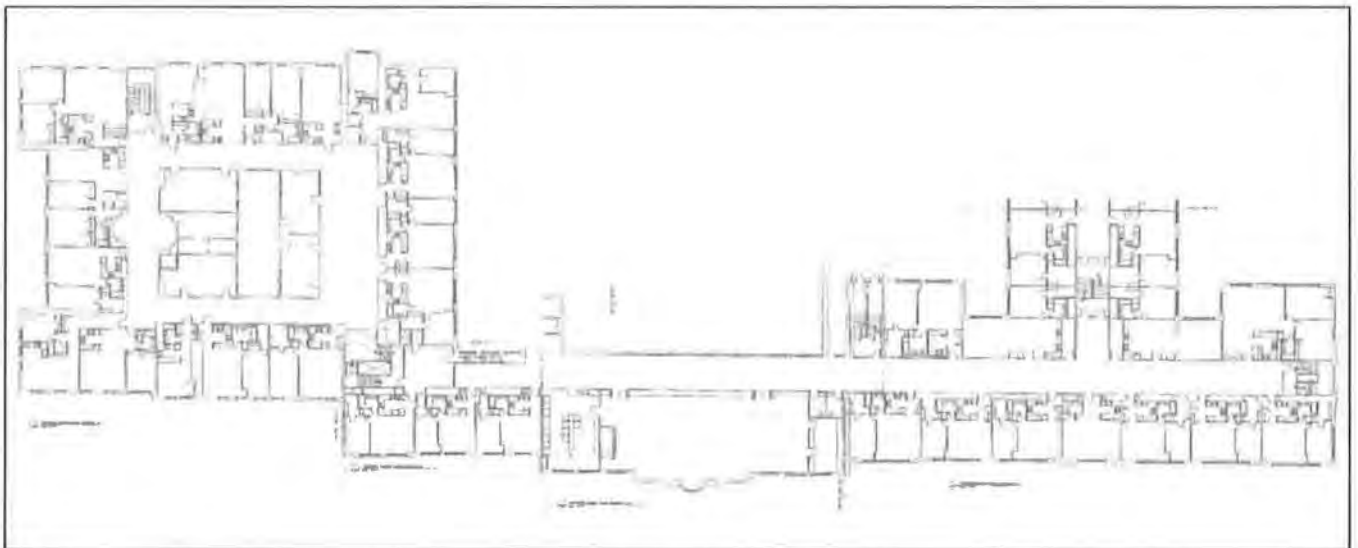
B: Existing Floor Plans – Building 1 – Second Floor
